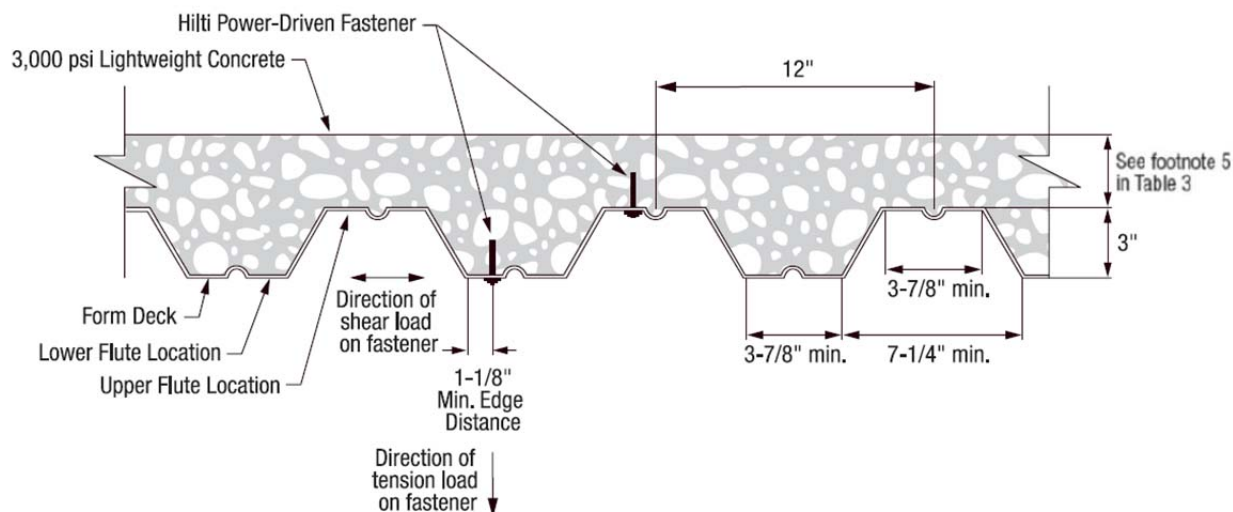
HILTI FASTENER LOCATIONS IN 3-INCH-DEEP COMPOSITE FLOOR DECK PANEL
